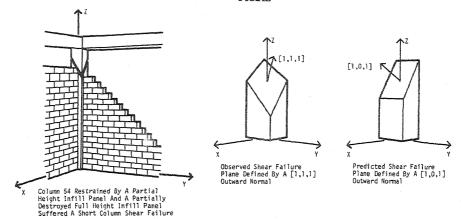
DETAIL OF THE SHEAR FAILURE OF THE CAPTIVE COLUMN 54
